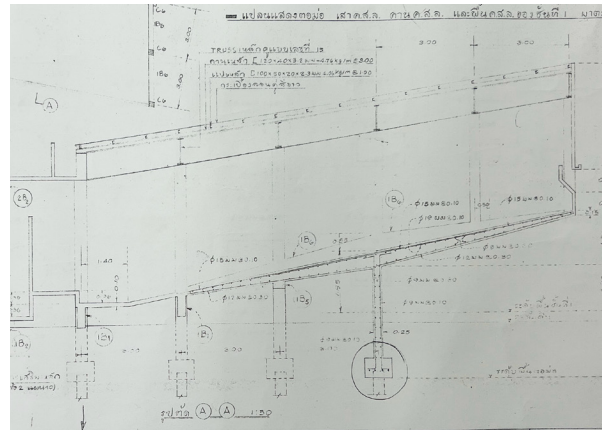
original structural Section show Column and cantilever beam (Department of Physics, 1967).
